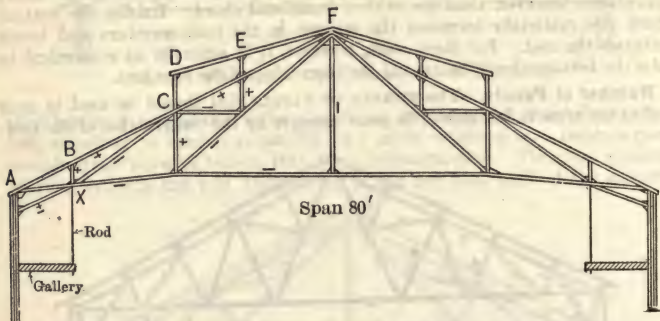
Fink Truss with Vertical Struts, for Drill-hall. Span Eighty Feet
